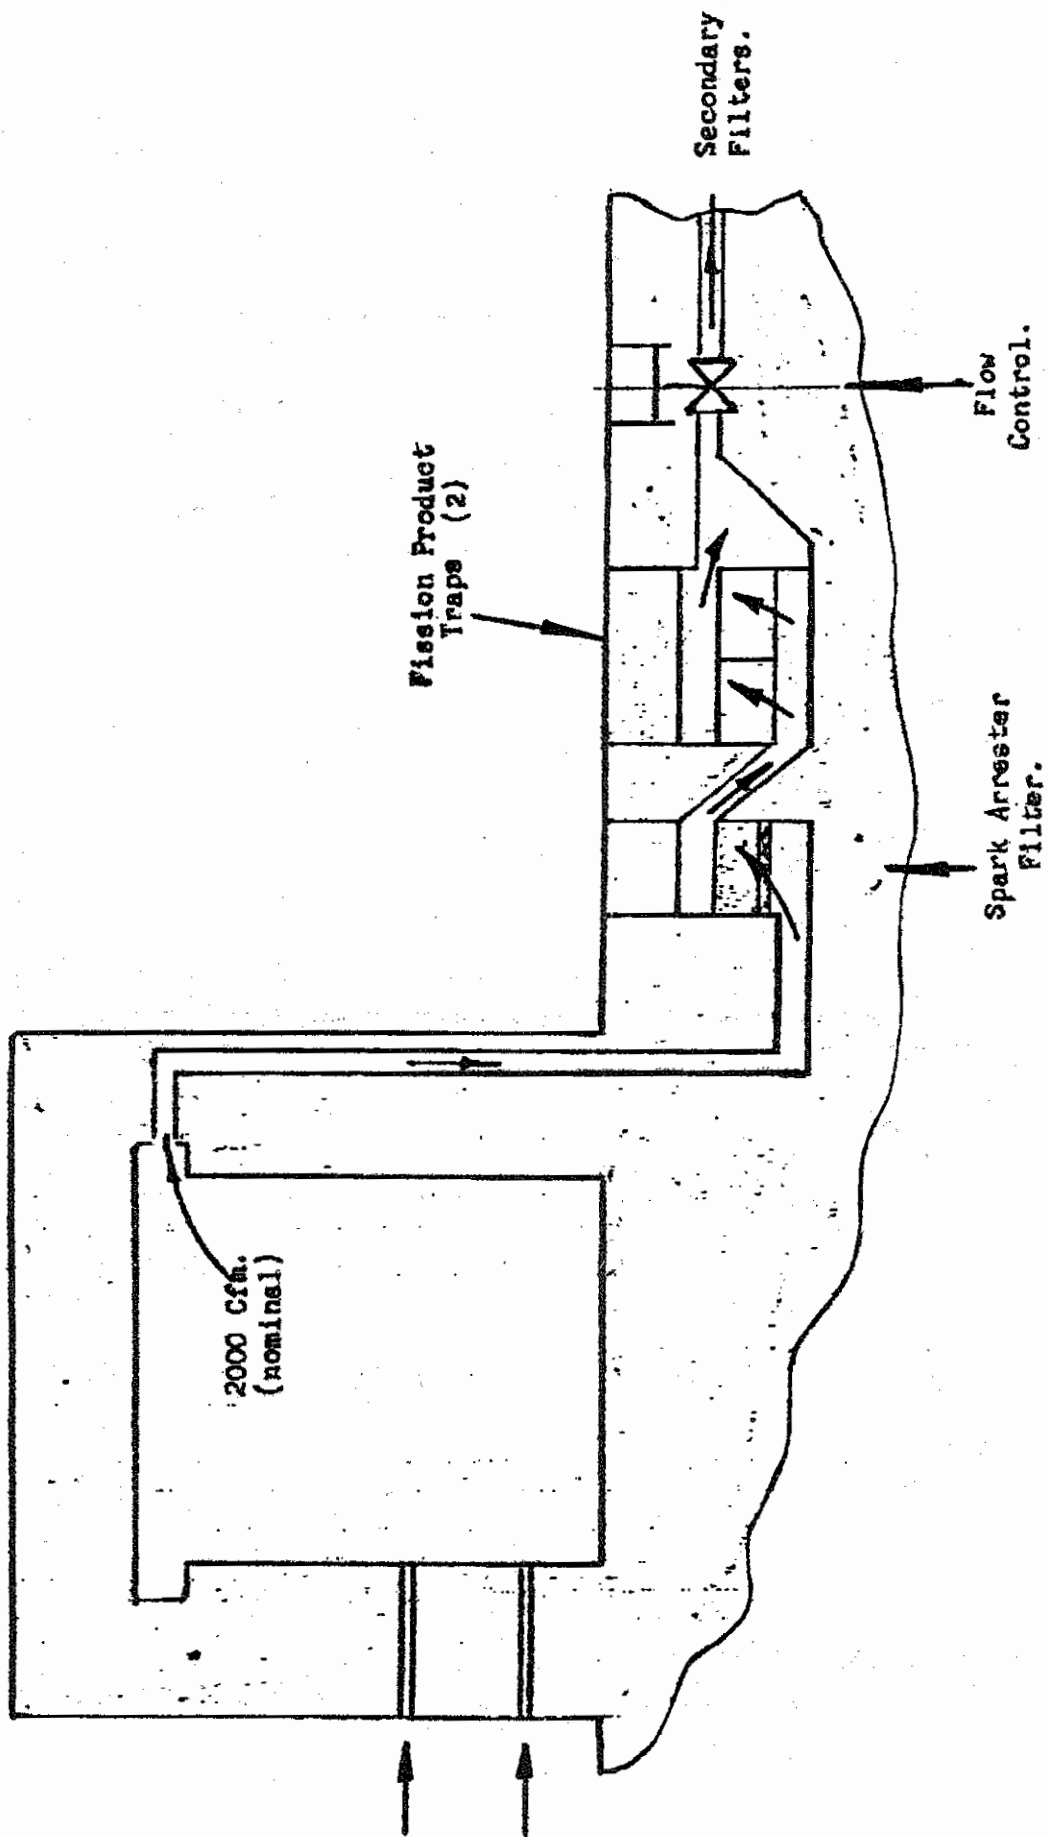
CAVE EXTRACT - Typical Section thro' extract duct
